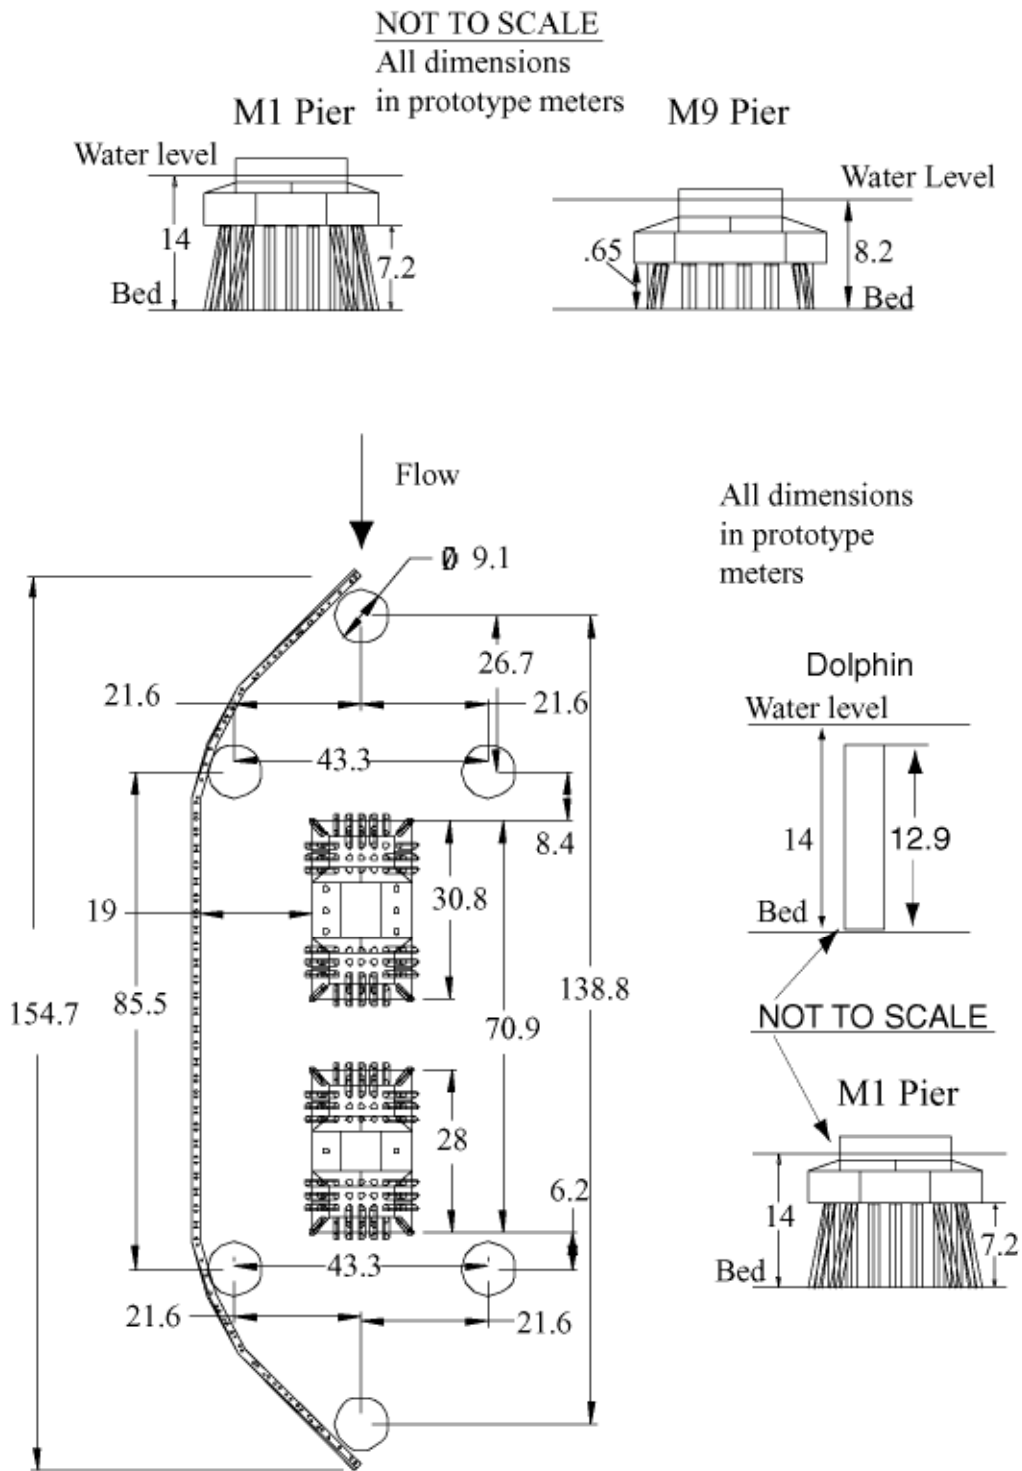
Diagram of the proposed Woodrow Wilson M1 pier with the dolphin and fender system.
